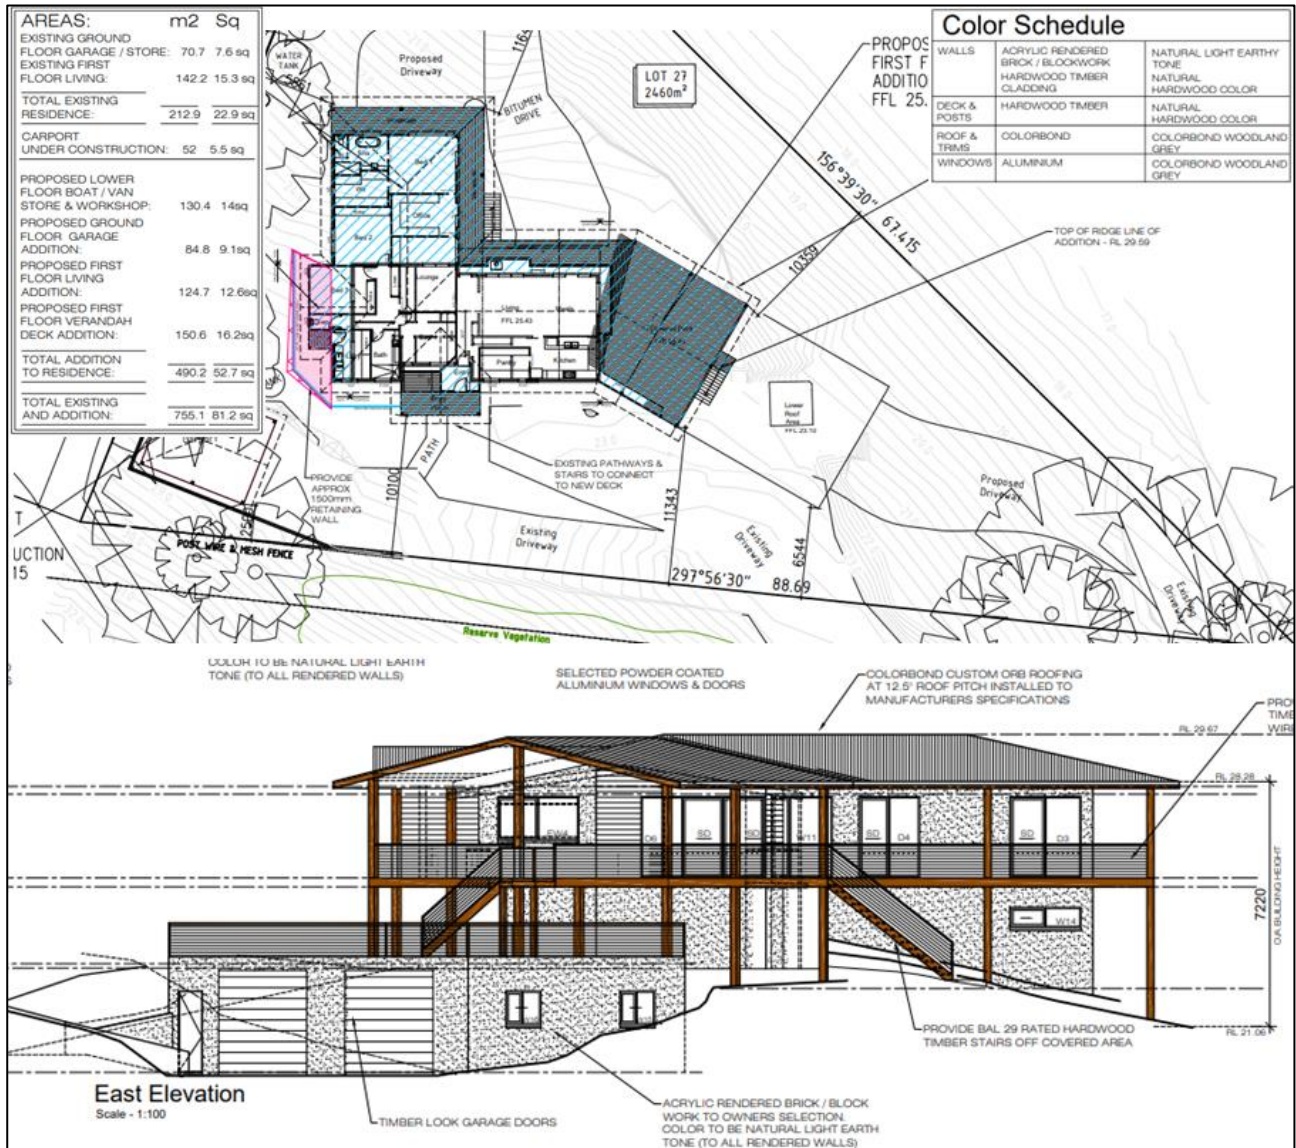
Proposed site and elevation plans including footprint extent, materials, and colours
